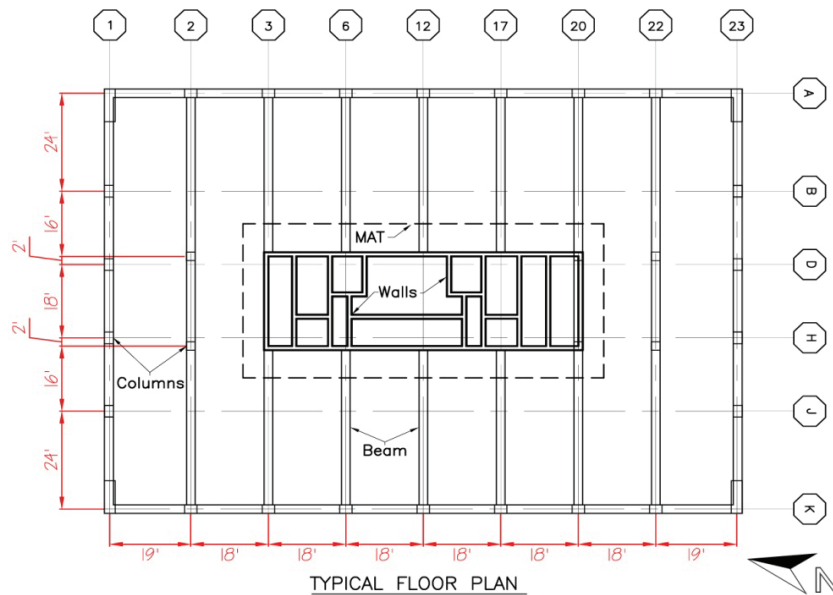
Walnut Creek building typical floor plan, based on construction drawings provided by CSMIP.
